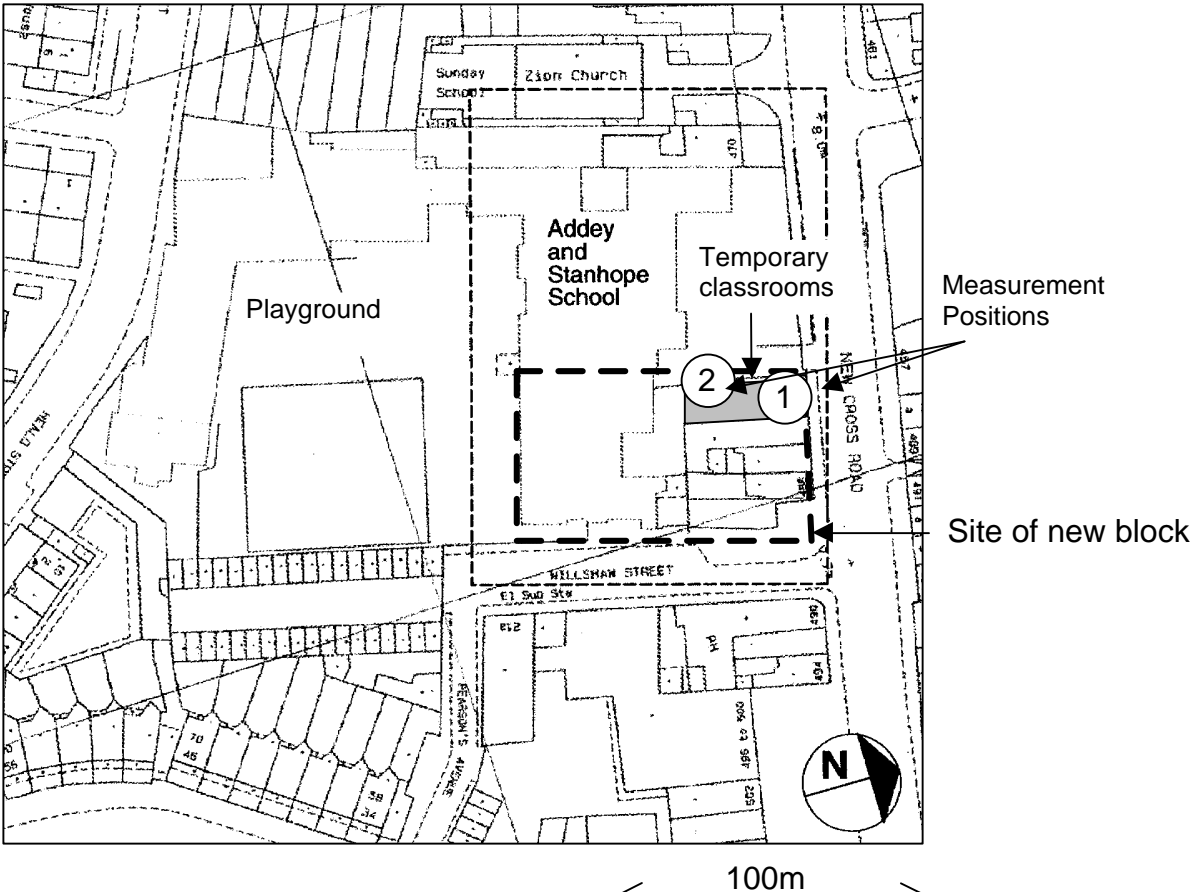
Addey + Stanhope School: Site Plan. The measurement positions are Indicated
